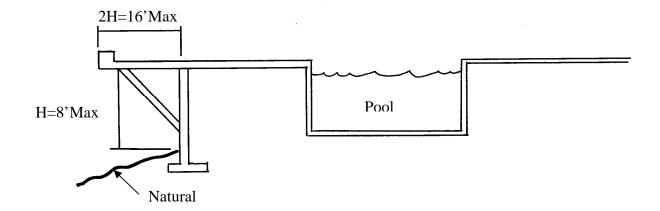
BUILDING HEIGHT WITH A WASH CROSS SECTION
